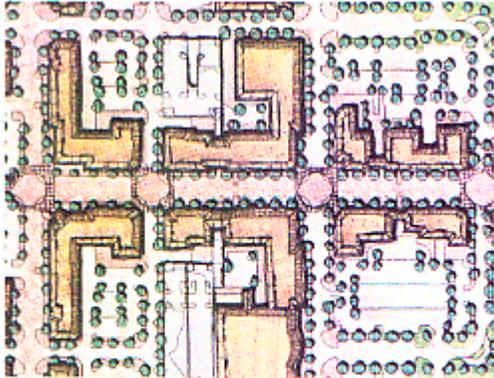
Dominant streetscape with parking at rear or sides of building.
